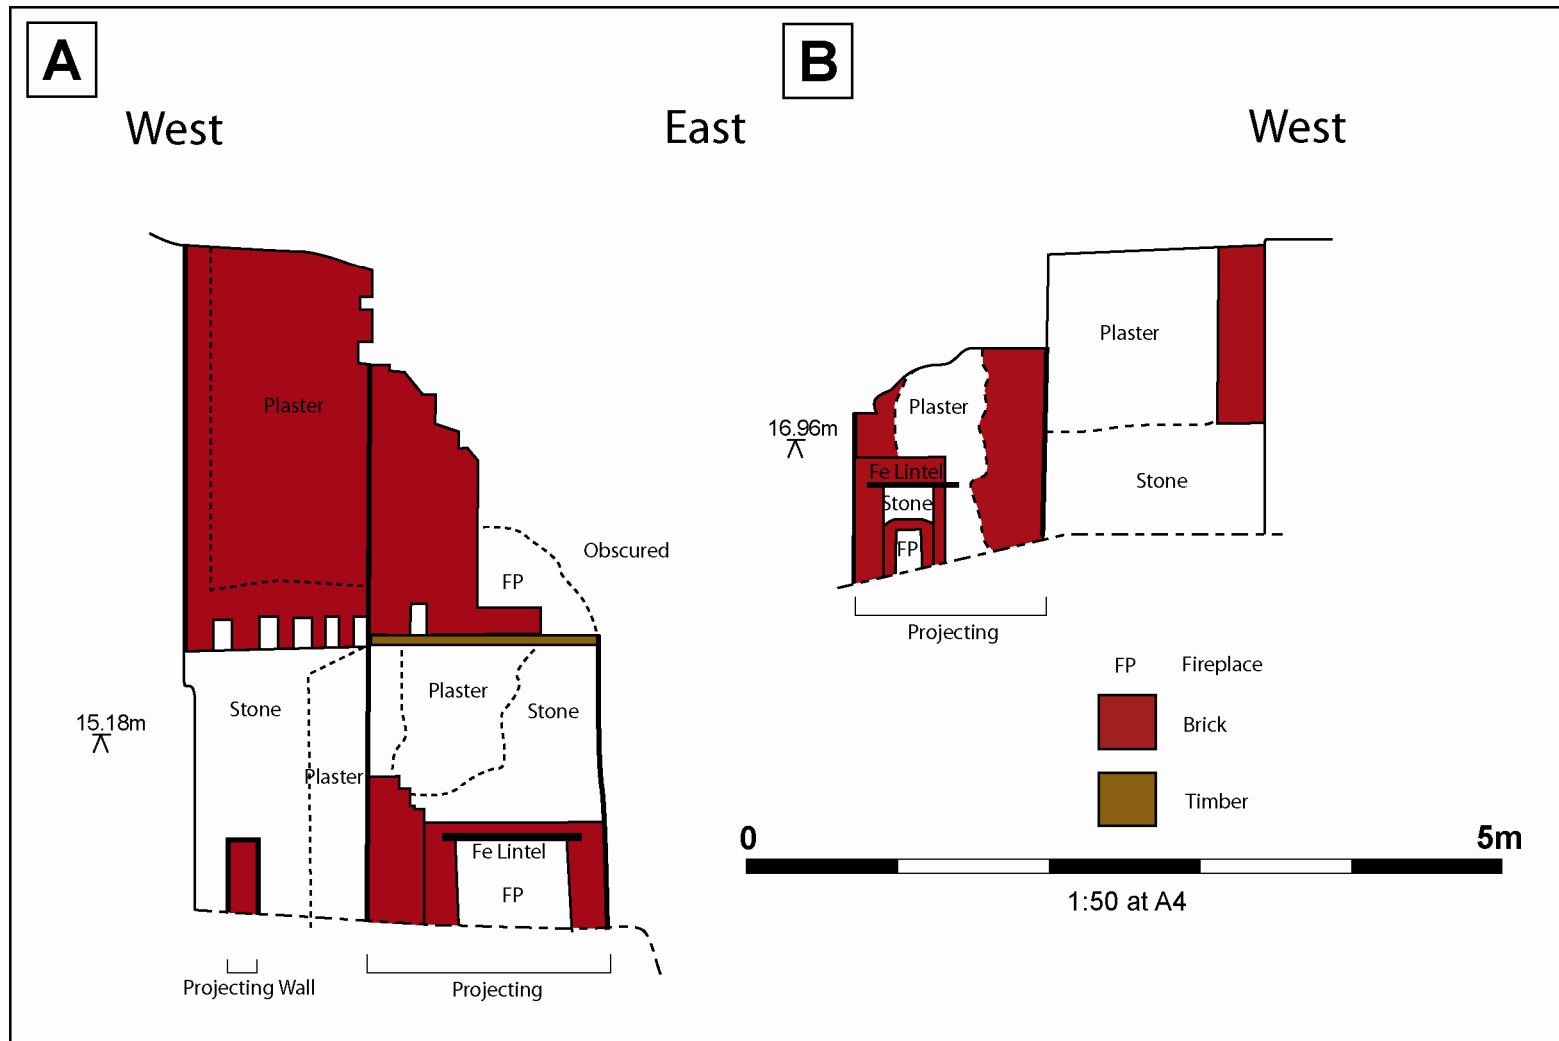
Elevation 6 viewed from the south-east (A) and north-west (B).
